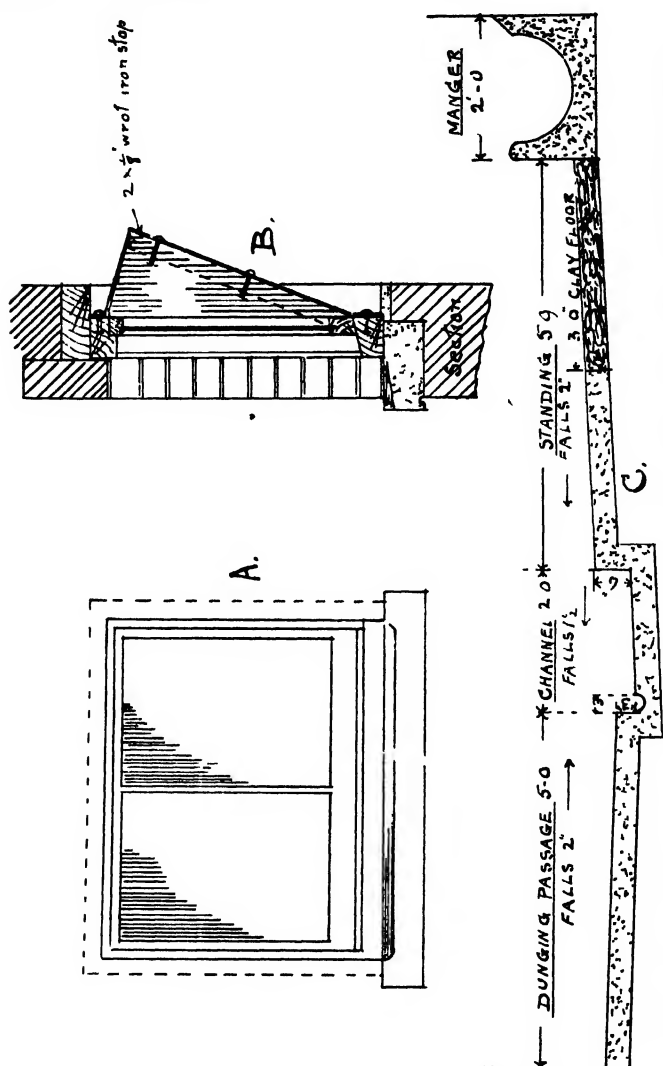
A and B—Details of Hopper Window. C—Section of Cow-house Floor: One Row of Stalls without Feeding-passages.
